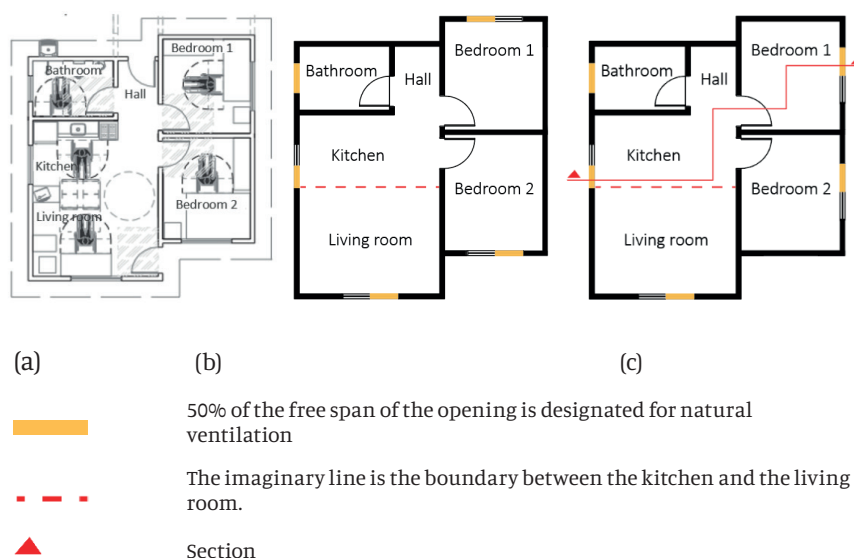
(a) Model of the floor plan of a representative HIS. Source: adapted from Triana, Lamberts, and Sassi (2015). (b) The floor plan model has room openings on the opposite walls. (c) The floor plan model has room openings on the adjacent walls. Source: adapted from Ribeiro (2022).
